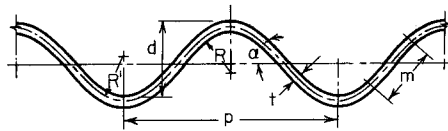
Cross section of typical arc-and-tangent-type corrugated sheets.
